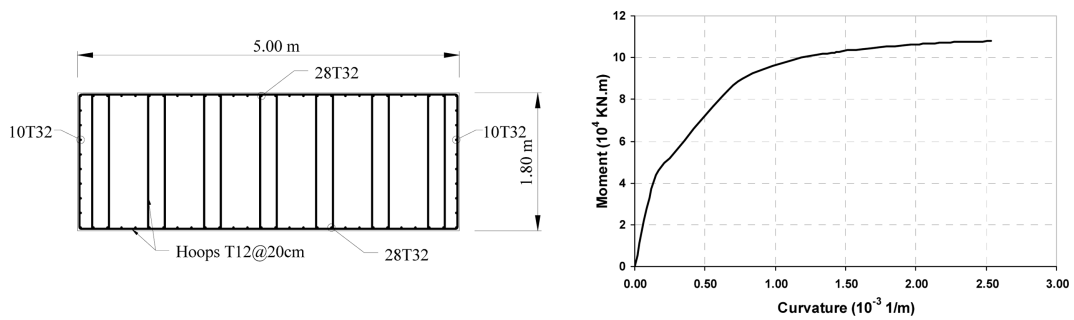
(d) Cross section and its moment curvature curve for the bridge pier (Sample bridge 4)
